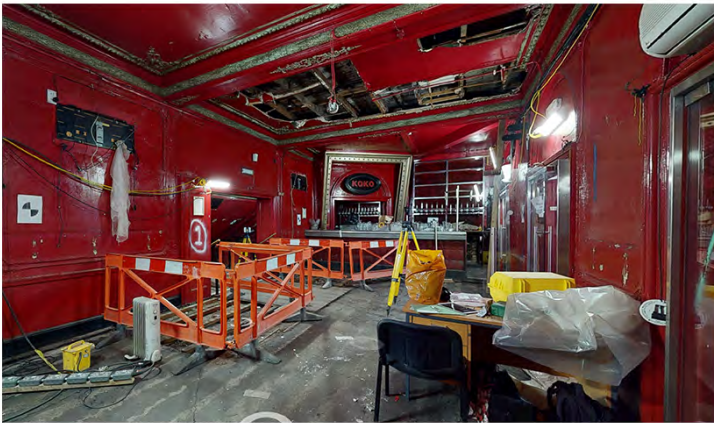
DEMOLITION / STRIP OUT first floor plan room 1-14
